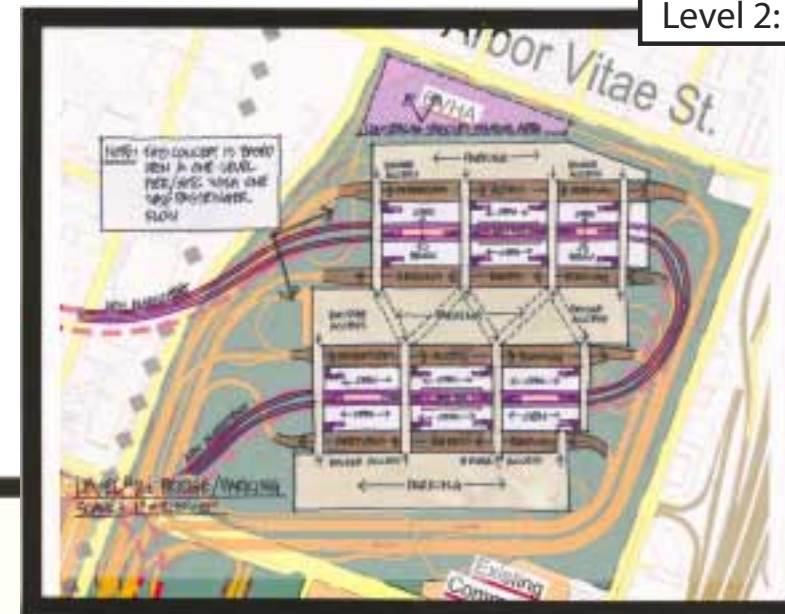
depicts a potential plan for the four new terminal processing facilities in the central core. The concept suggests a garden or outdoor park in between terminal blocks.
